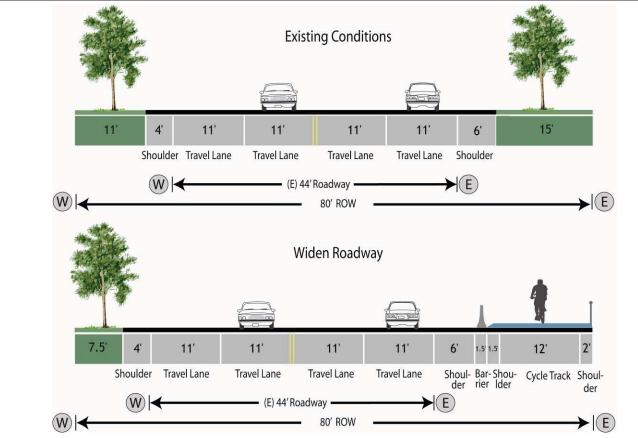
Conceptual Section 2.3.1 - Widen Trail 15' (E), Widen Roadway 3.5' (W), Restripe for 130'
